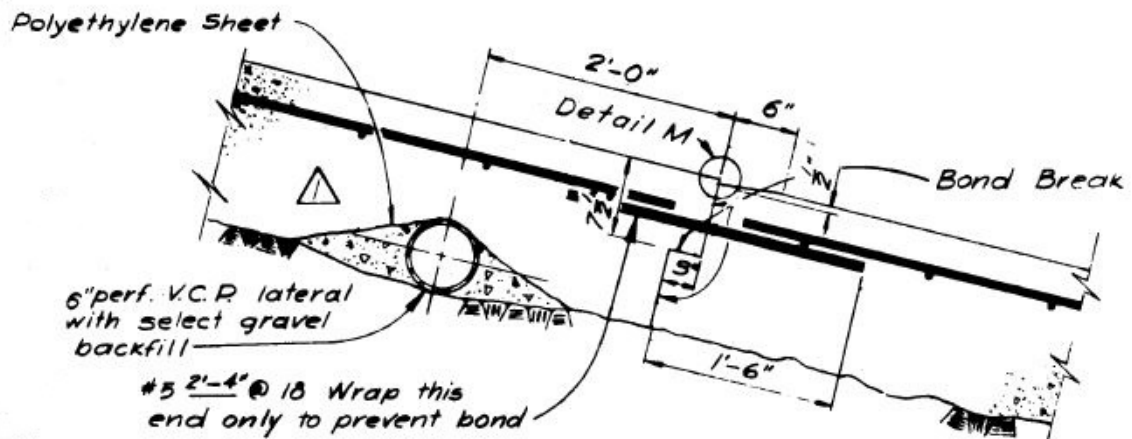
Oroville Dam Spillway – Transverse Joint Detail
